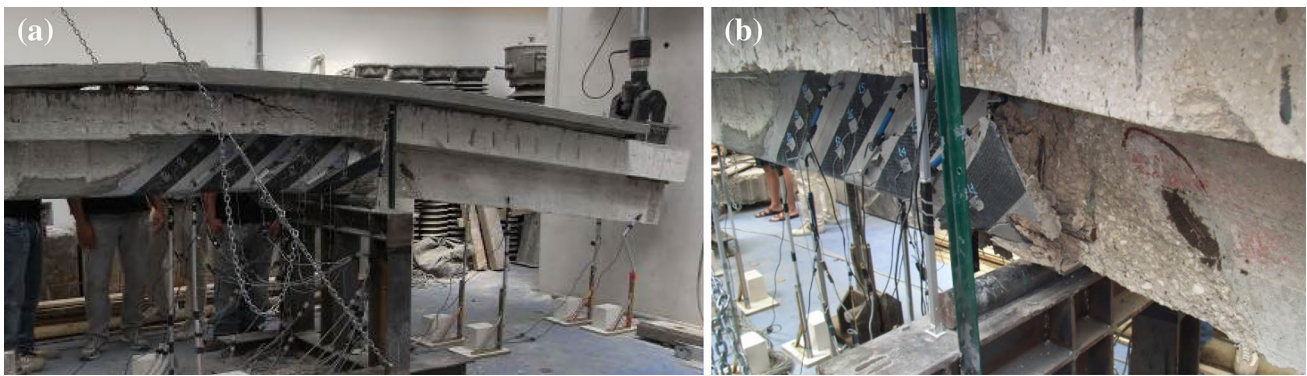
Retrofitted beam S-TM1-A damage after the failure test; a damage at support B with negative moment; b detail of lateral ejection of concrete due to the interruption of the lower steel reinforcement
